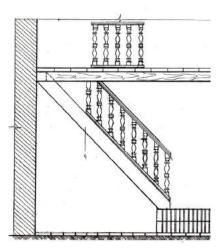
Typical stairs in Sheki only serve their primary function. They are usually in a straight run and made from masonry or wood.
